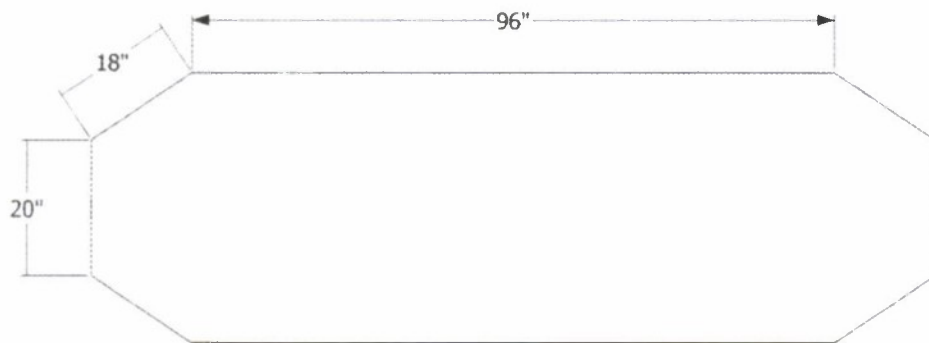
Plan view of symmetrical HRAP frame design. Note: The actual dimensions of the ponds are slightly larger due to the spacing created by connecting hinges.
